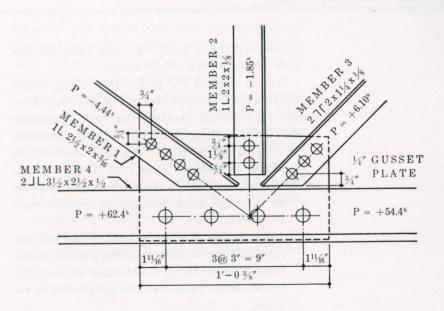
Typical riveted joint in aluminum. See Example 4-1 on Page 87.
